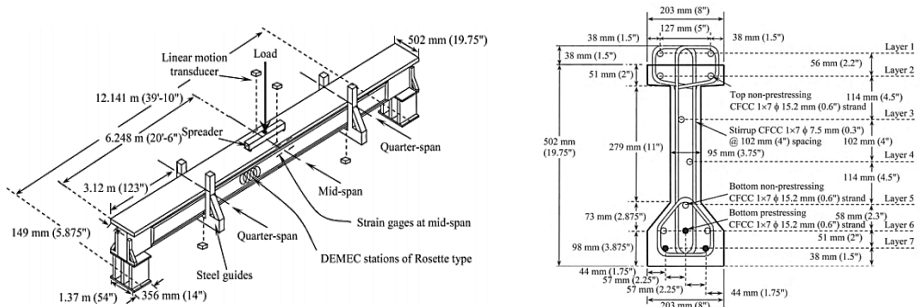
Dimensions and Cross-sectional details of I-beam.
